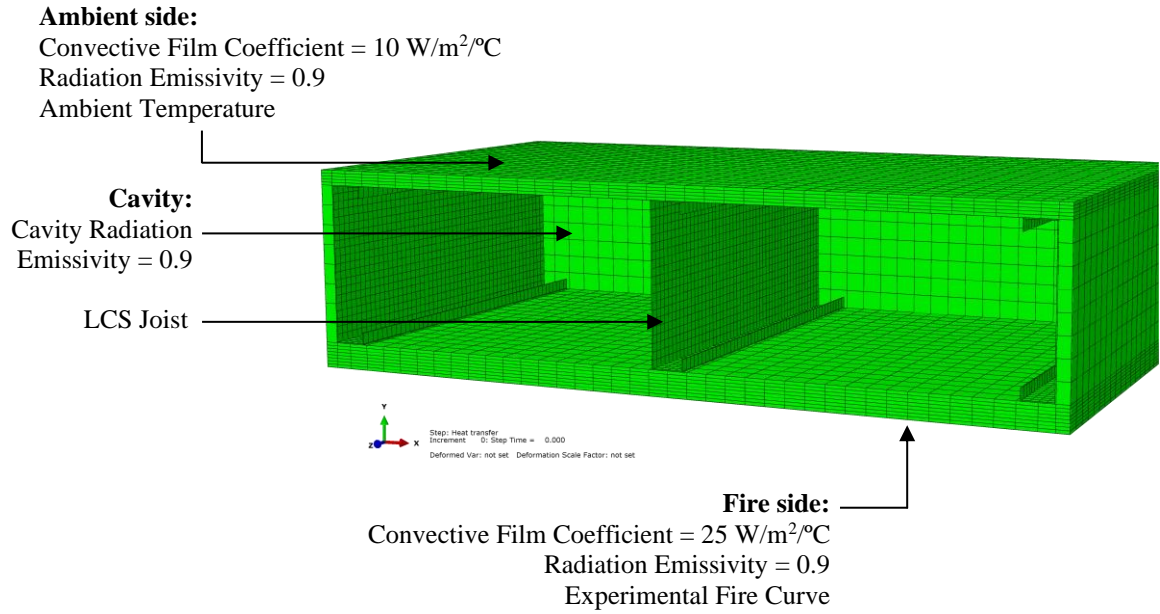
Finite Element Model of LSF Floor-Ceiling Systems made of LCS Joists
